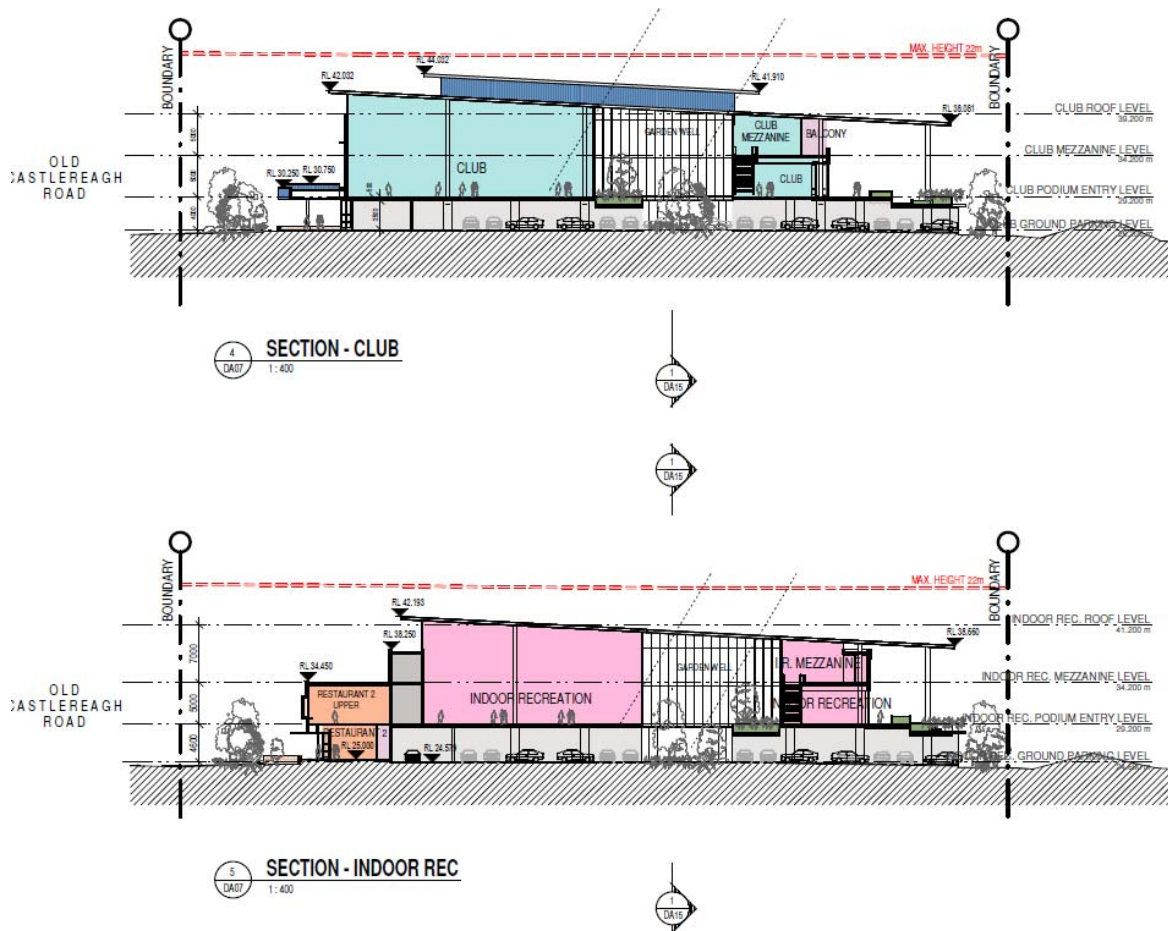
Proposed club and indoor recreation section, depicting height of building line dashed red
